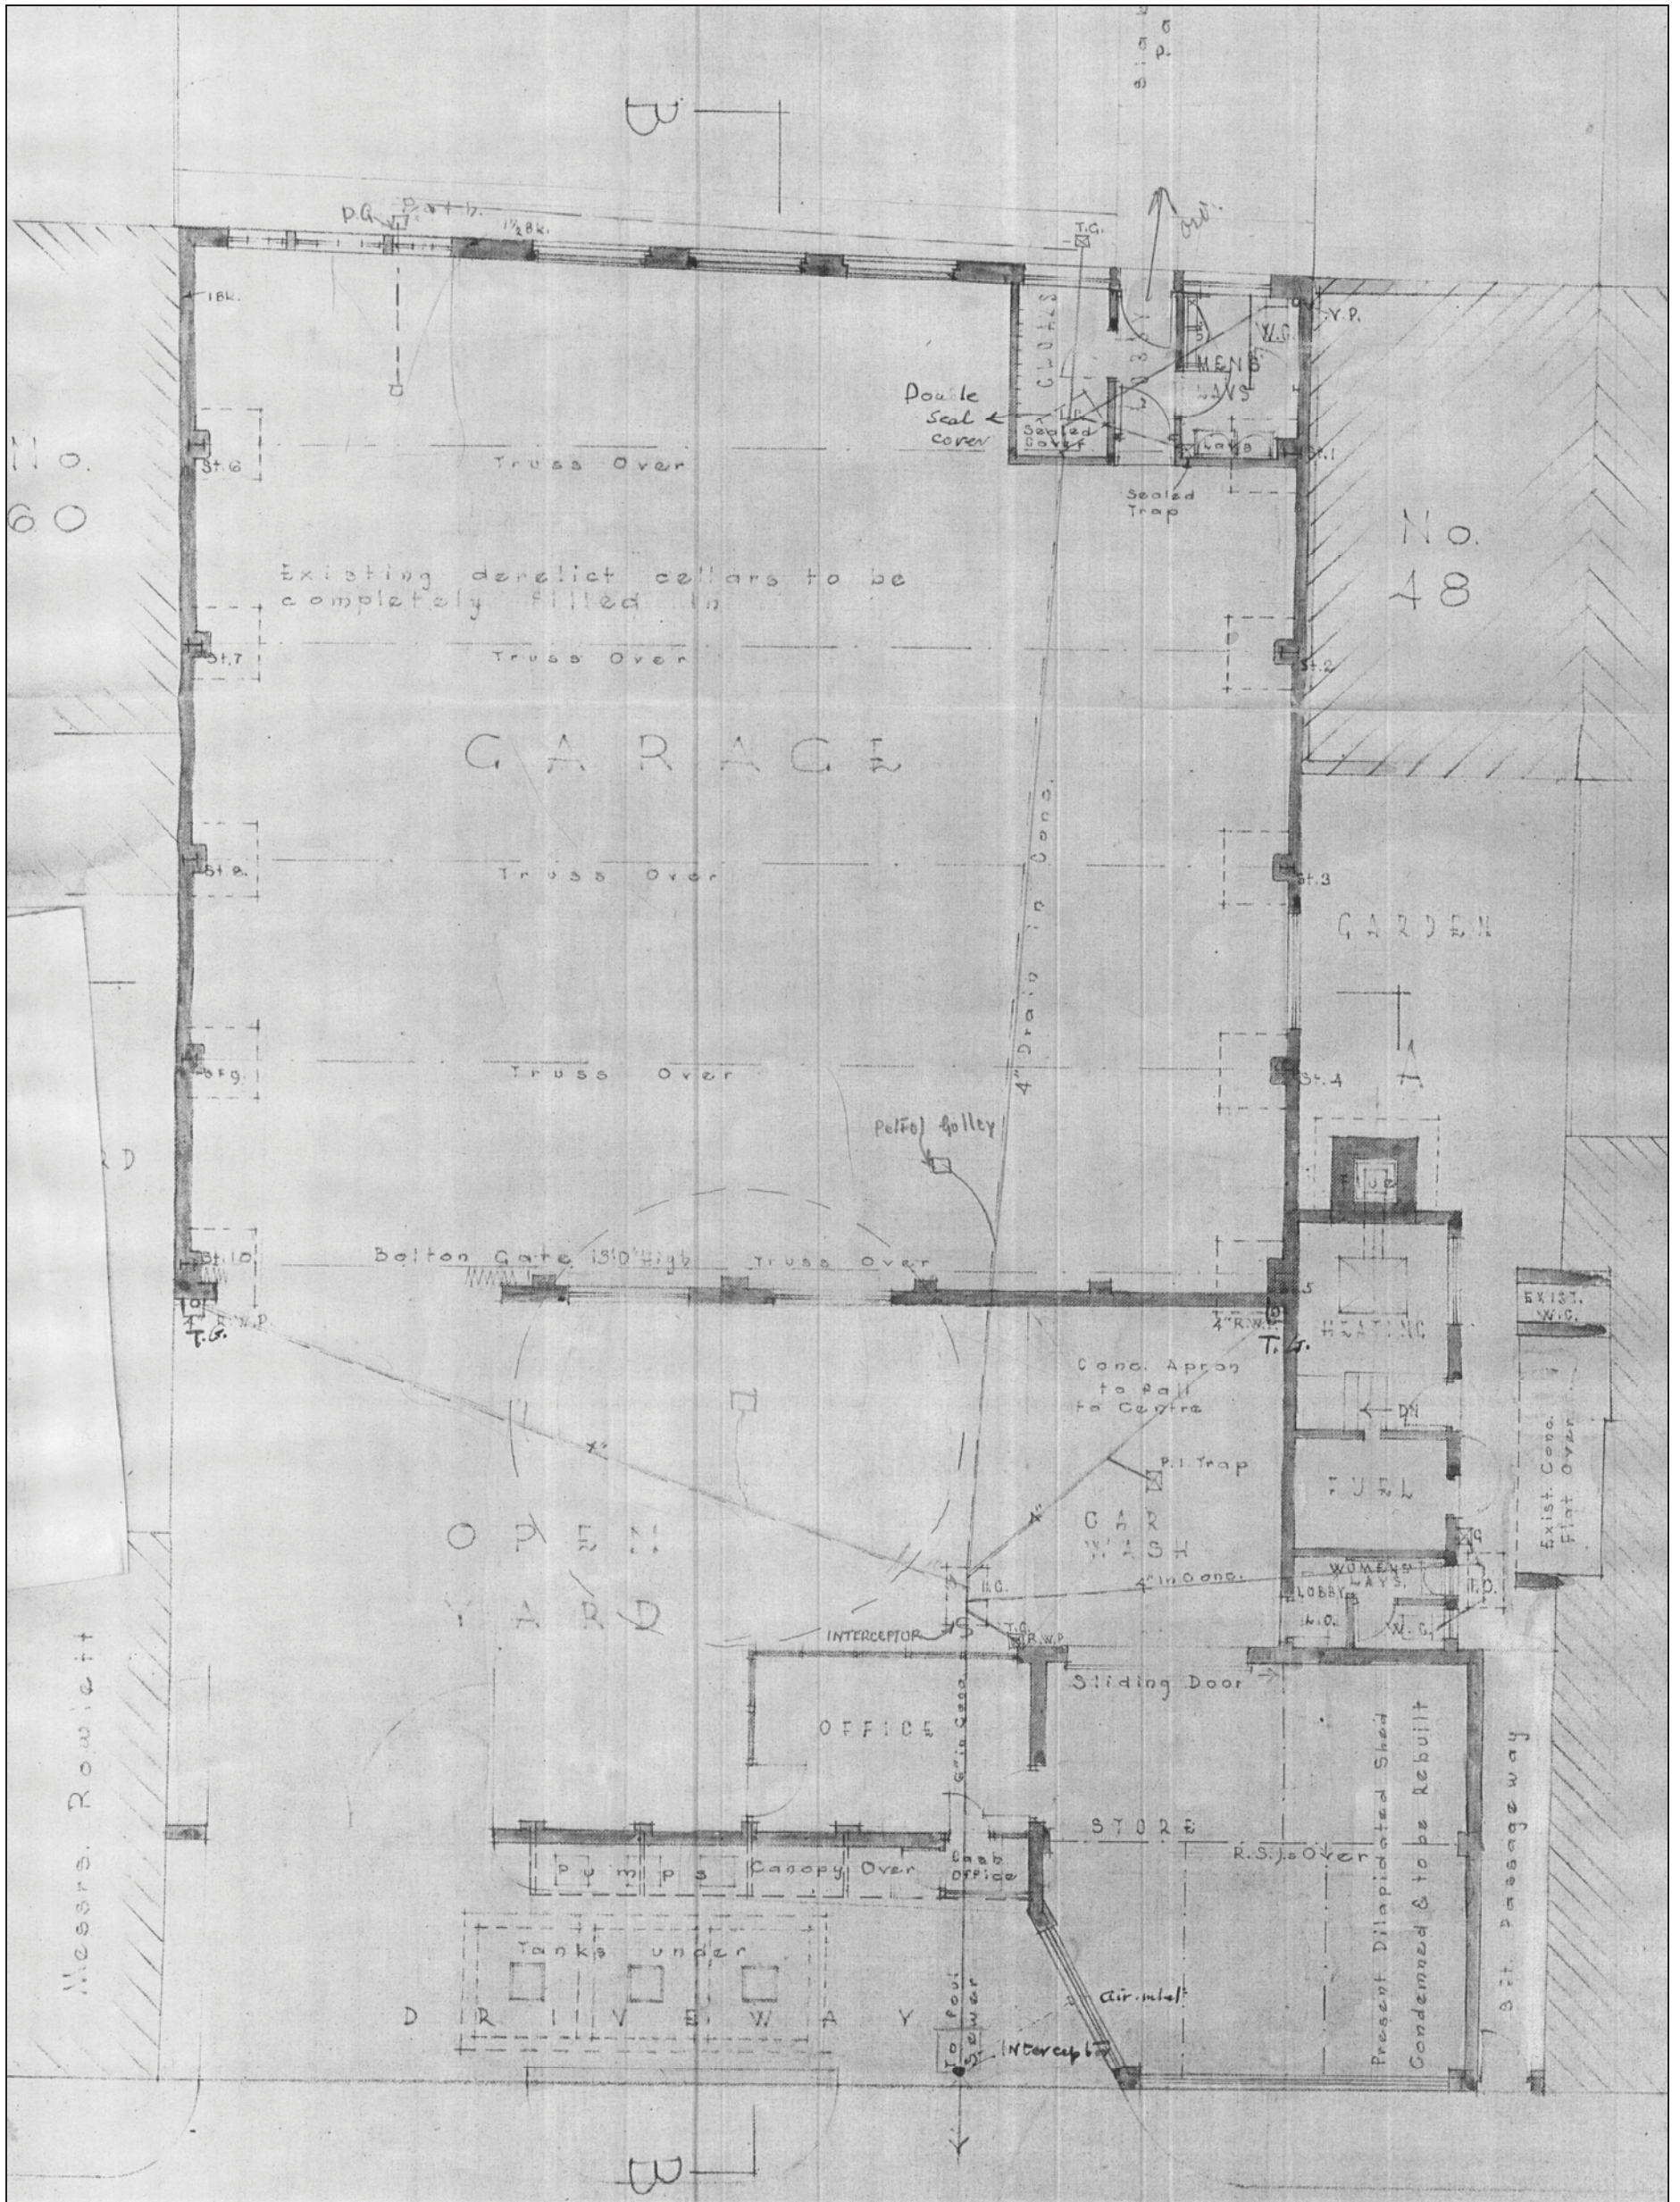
Floor plan of Sibson's Garage (Stockdale Harrison & Sons, 1951; taken from LBR Plan 76644)
